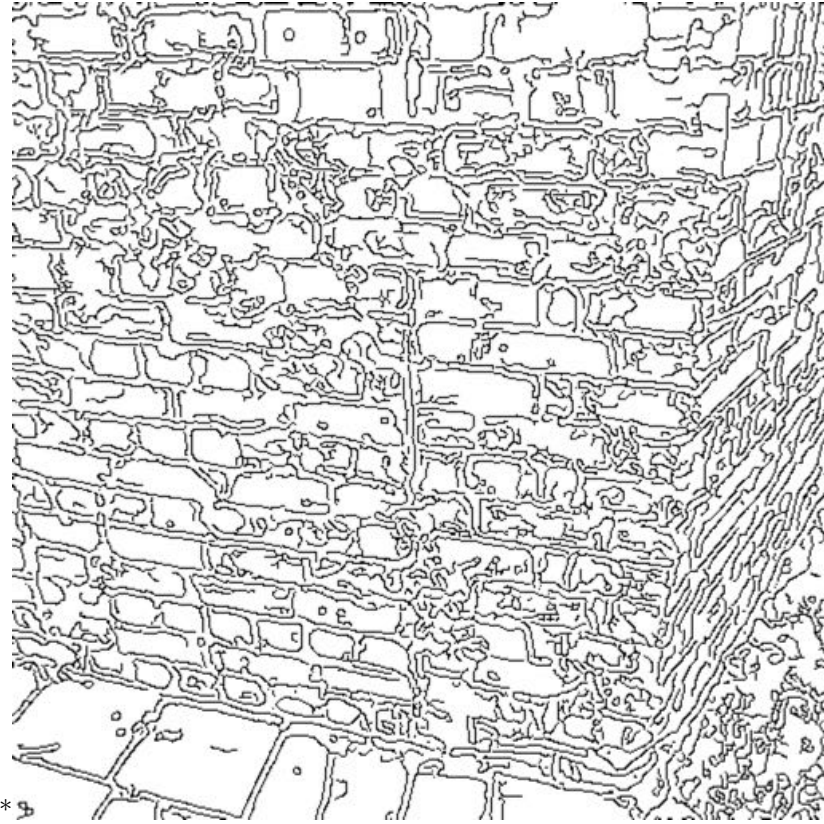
Edge detection on a brick wall seems a bit loaded...Can you see the crack?
